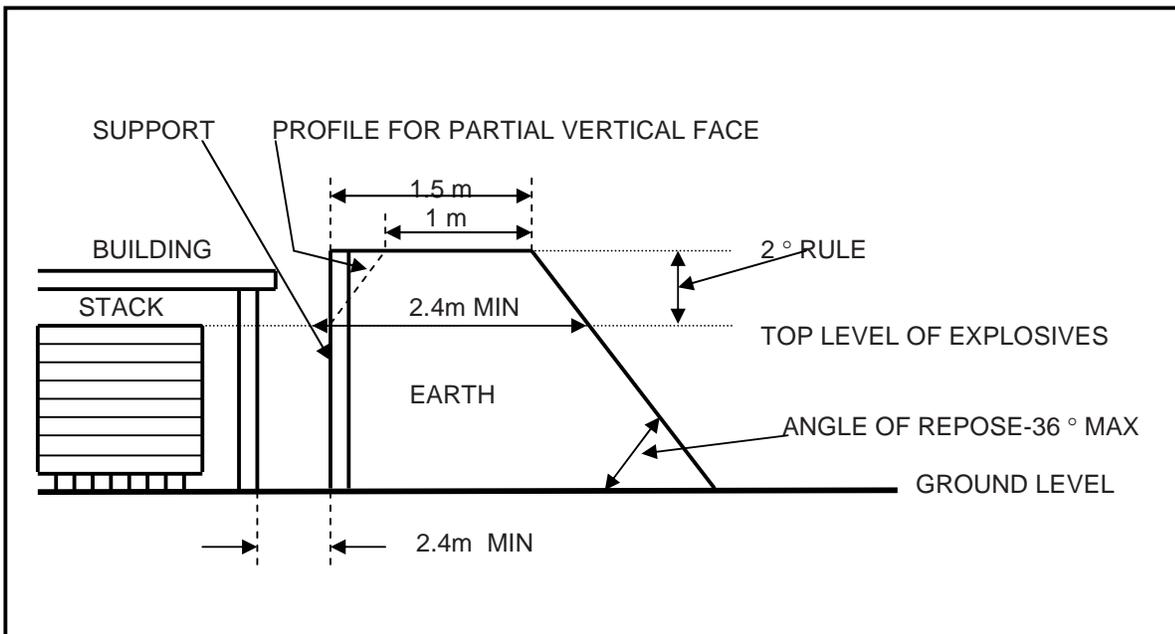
Single Slope Vertical Face (or Partial Vertical Face) Barricade
